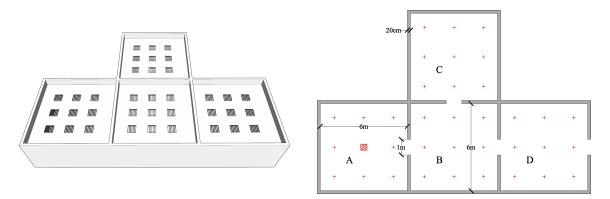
Perspective (left) and the floor plan (right) of the base model for the simulations.
